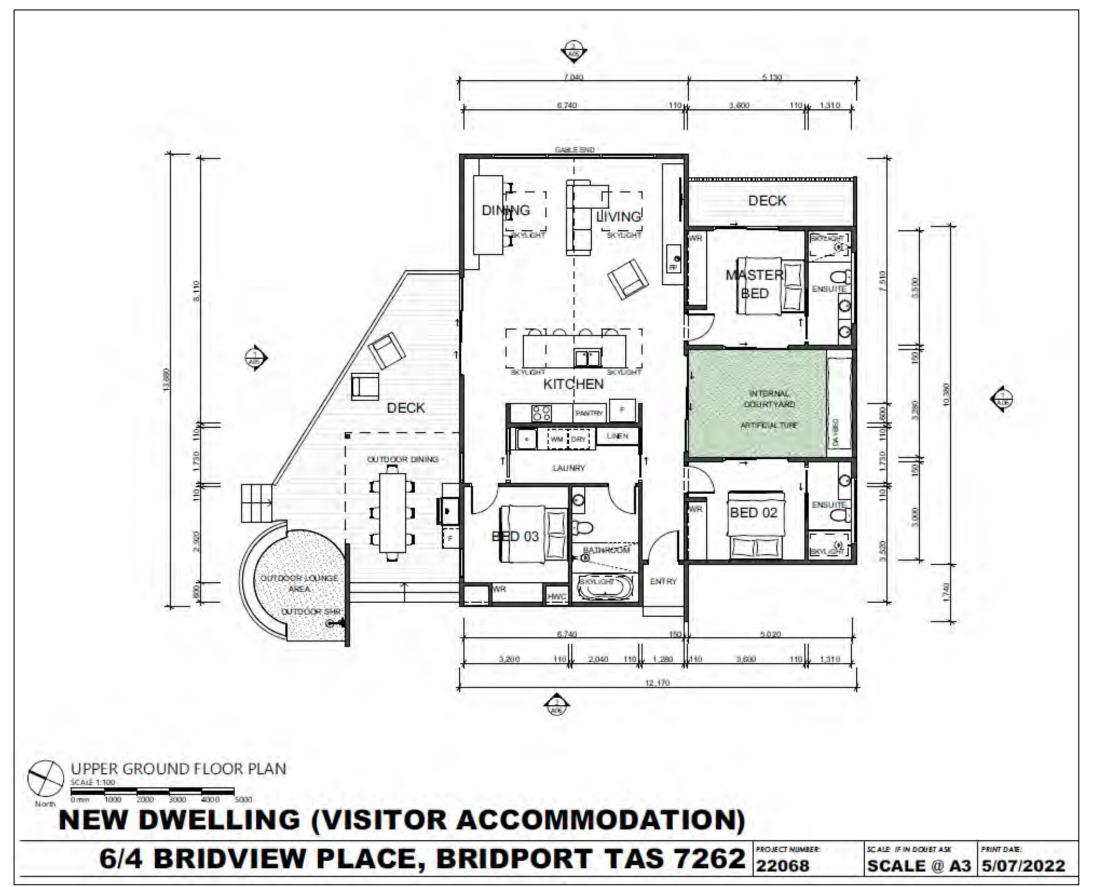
Upper ground floor plan of proposed visitor accommodation unit (source: Plans to Build 2022
